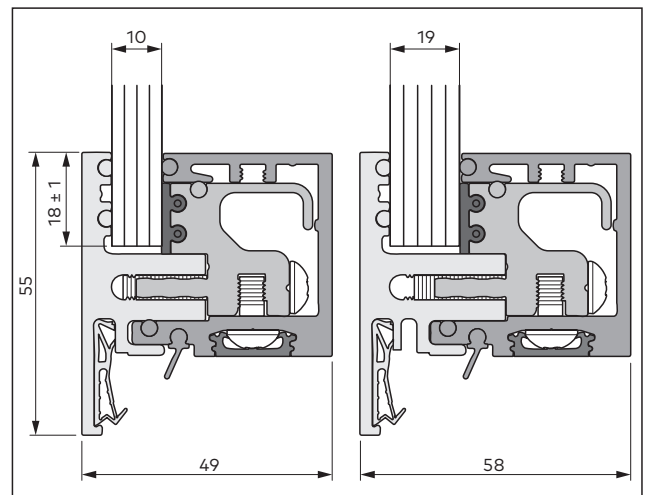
Dimensions of the mounted door frame for side panels of 10 - 19 mm glass thickness
